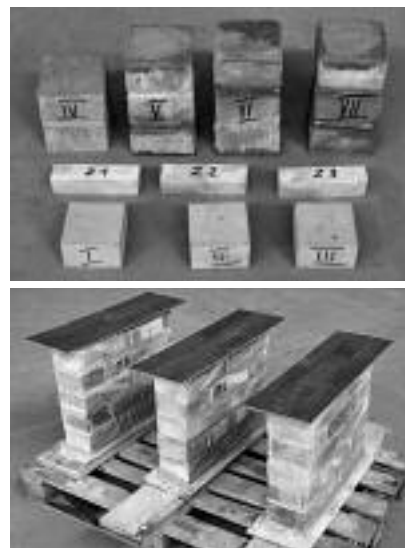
Brick and wall samples, marked as 2a ÷ 2d, prepared to study
